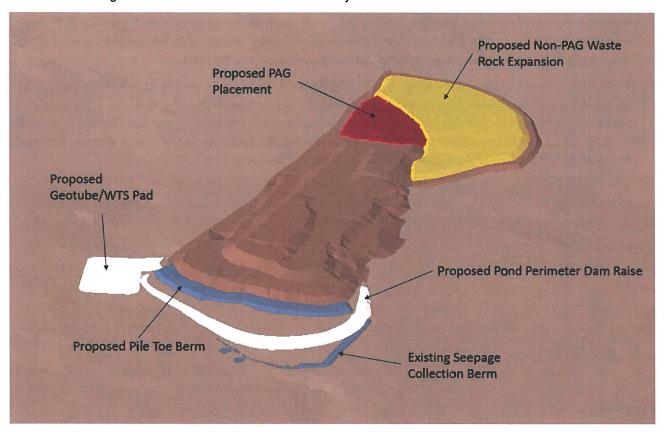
Summer 2018 Waste Rock Deposition Plan-Plan View
